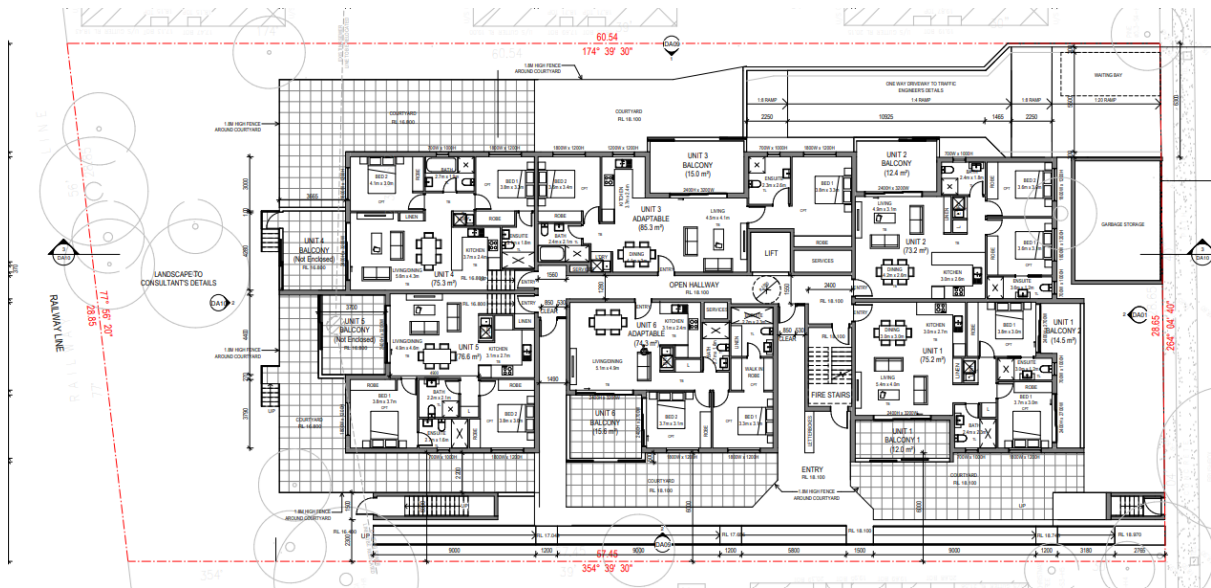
Extract of proposed ground floor plan (Source: Colin De Lore and Associates, 2023).
